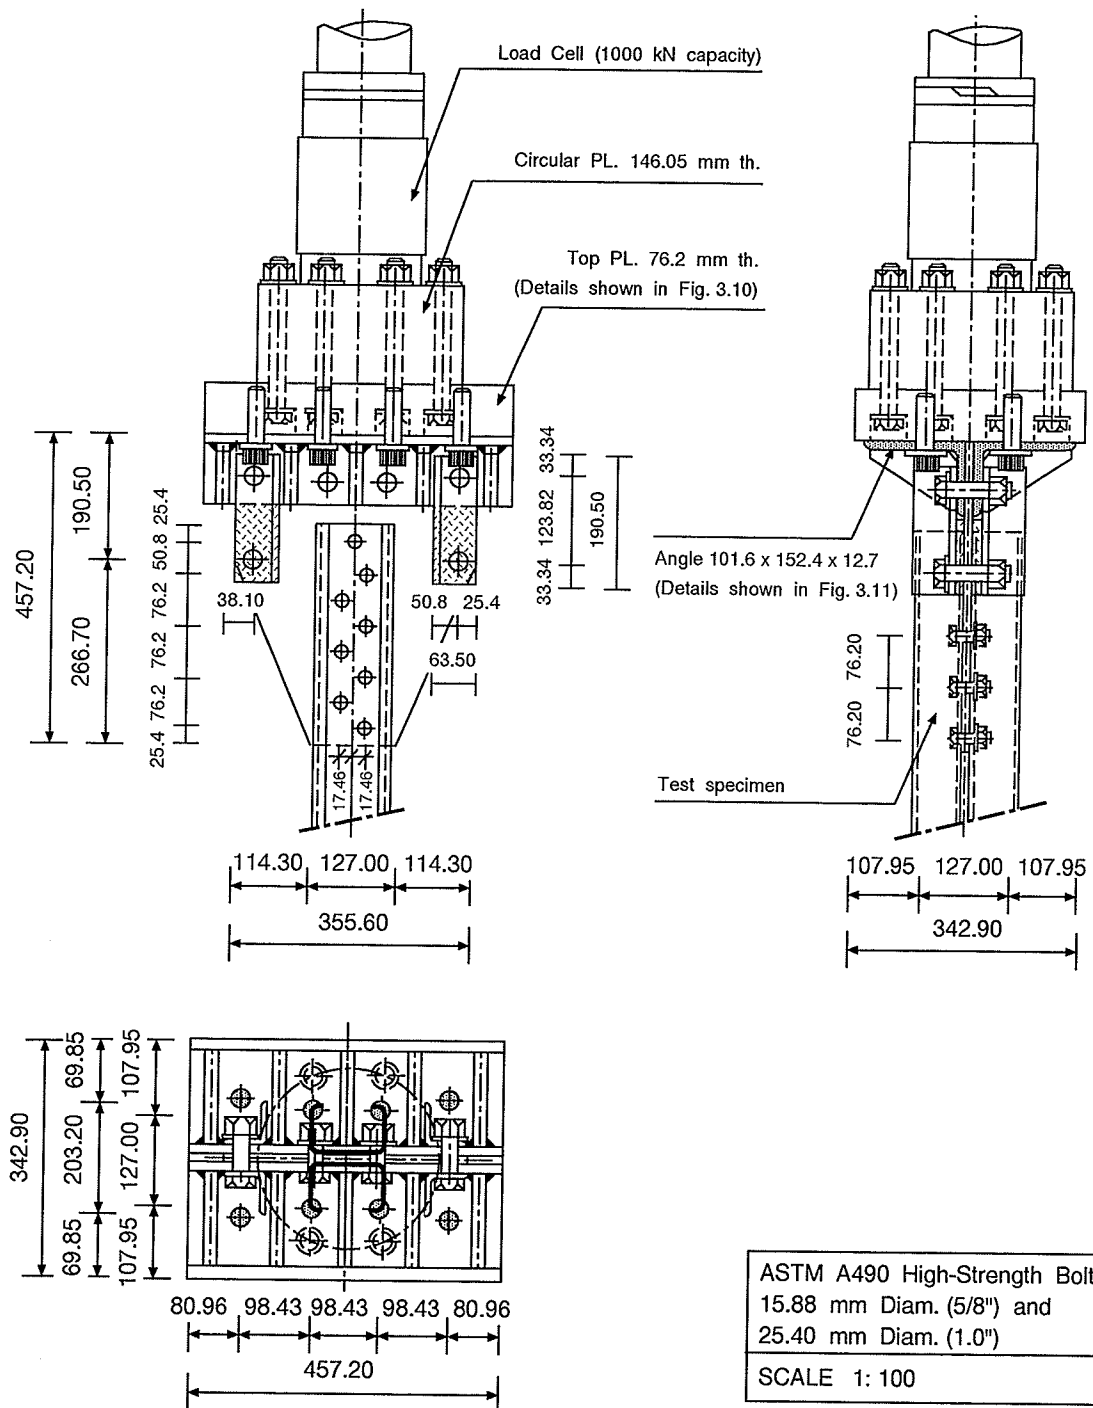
Connection Type "G-Top" Used with Test Setup # 2.
